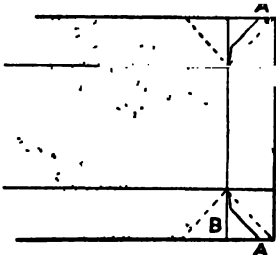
Setting out end of box gutter : A, 1 in. allowed for underlap ; B, metal cut.
